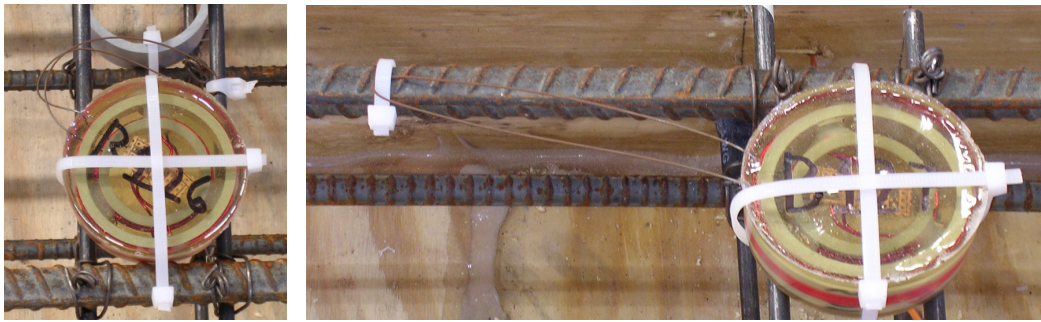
Photographs of sensing wires attaches to transverse reinforcement (left) and of sensing wires attaches to longitudinal reinforcement (right) (Puryear 2007).
